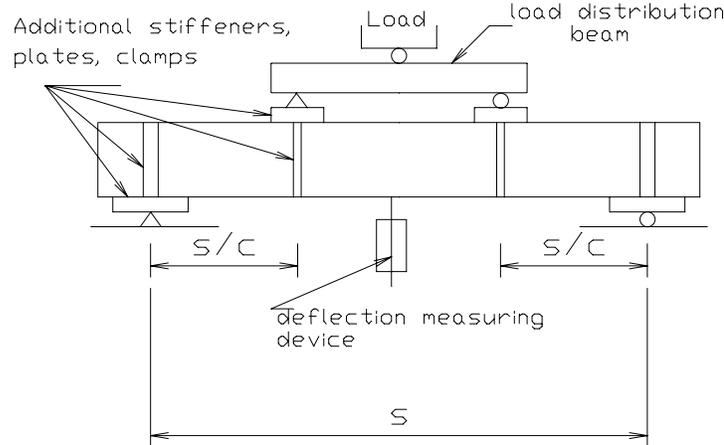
Simply-Supported Pallet Beam Tests.
